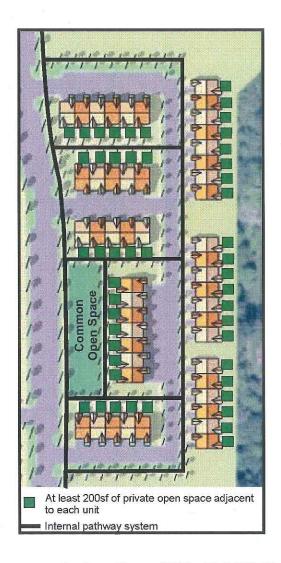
Example townhouse configuration with a combination of private open spaces adjacent to units and larger common open space accessible to all units.
